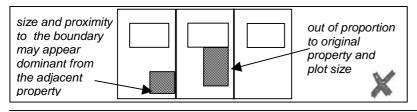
Example of Problems with Single Storey Extensions & Outbuildings
